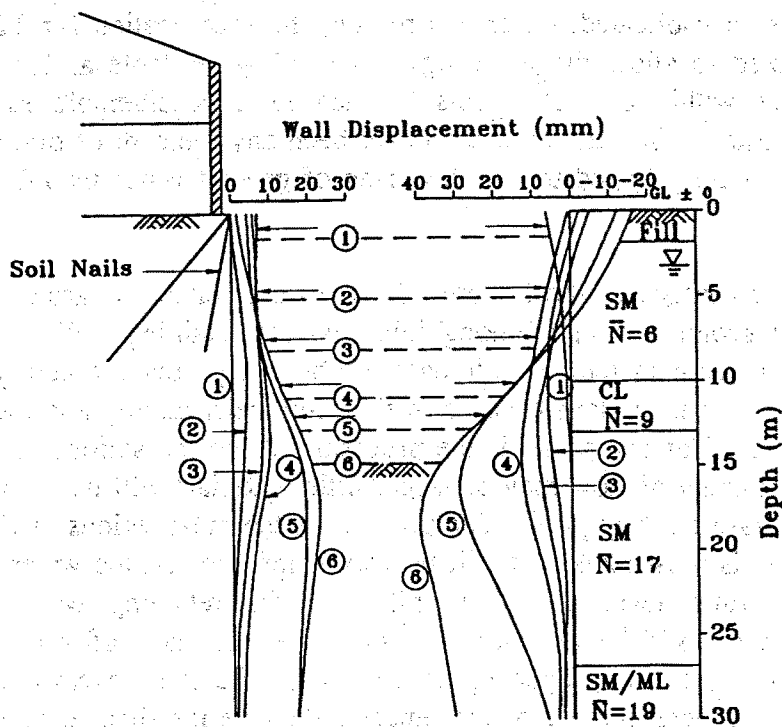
Reducing Wall Deflections by Soil Nailing (redrawn from Ou et al, 1991)
